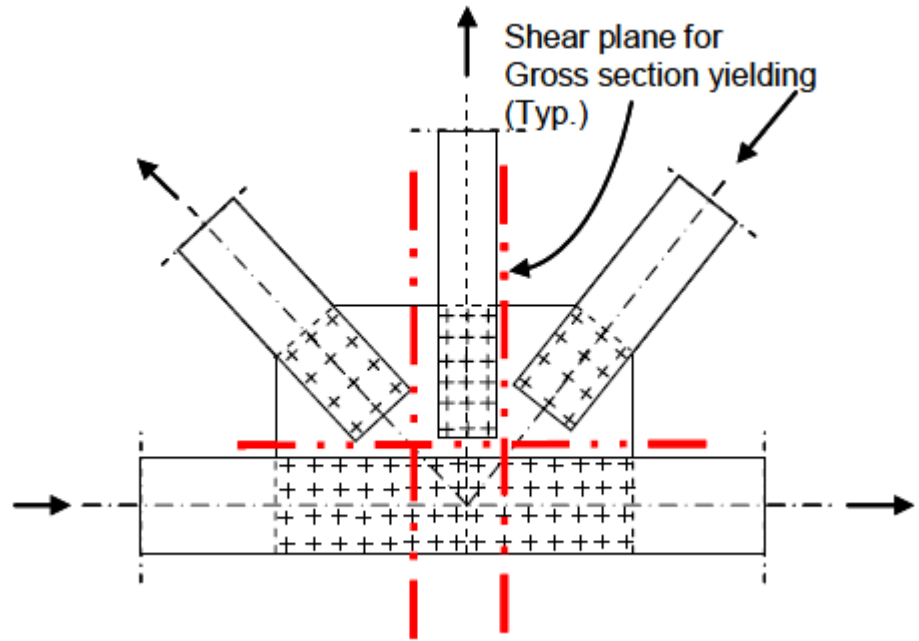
Examples of Gross Section Shear Yielding Planes
